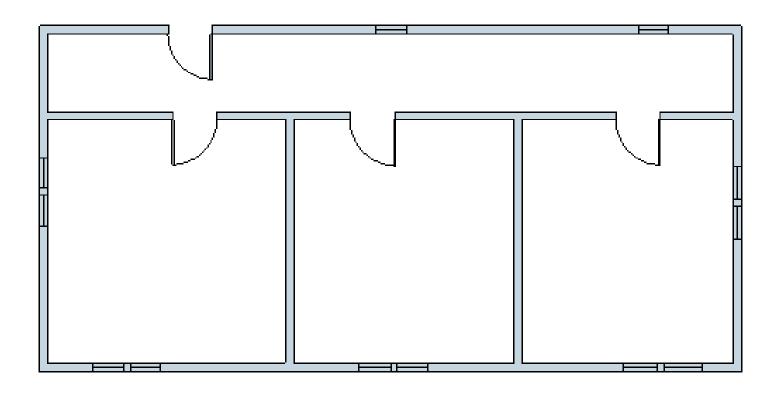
Rendering of what the original floor plan of the first story would look like (rooms unlabeled)
